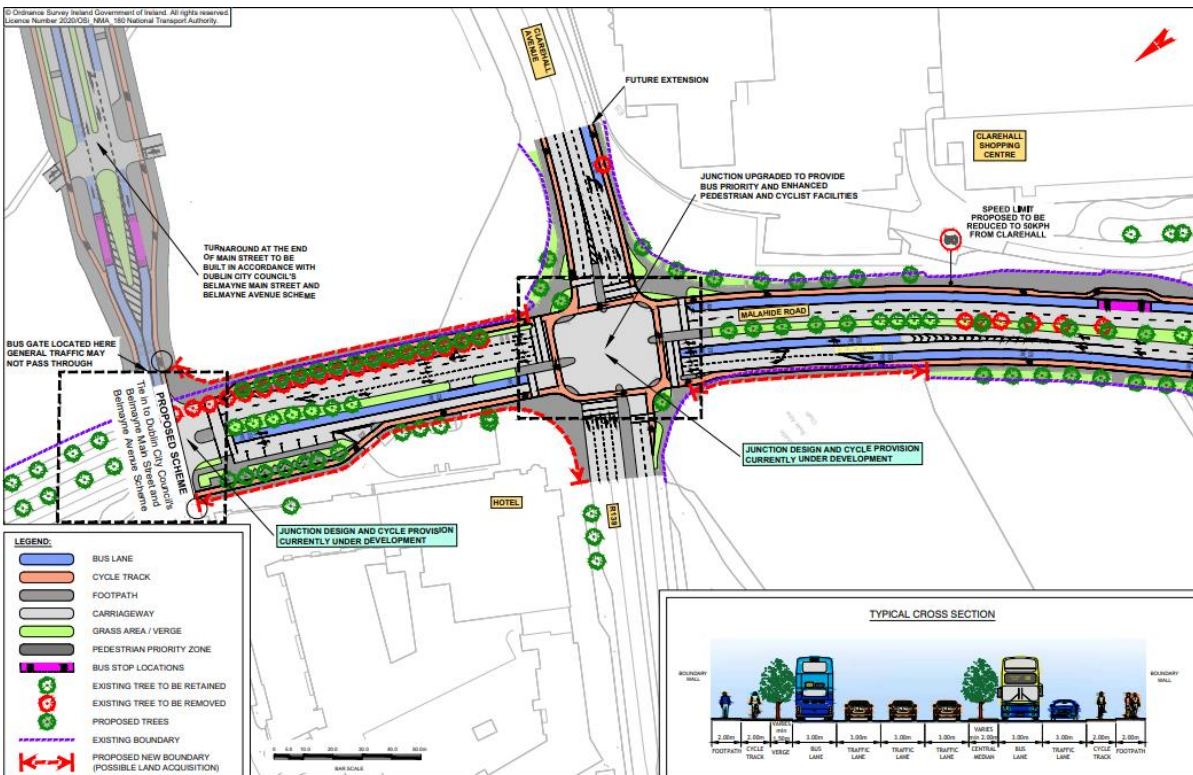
| BusConnects – Proposed Clarehall Junction Layout.
